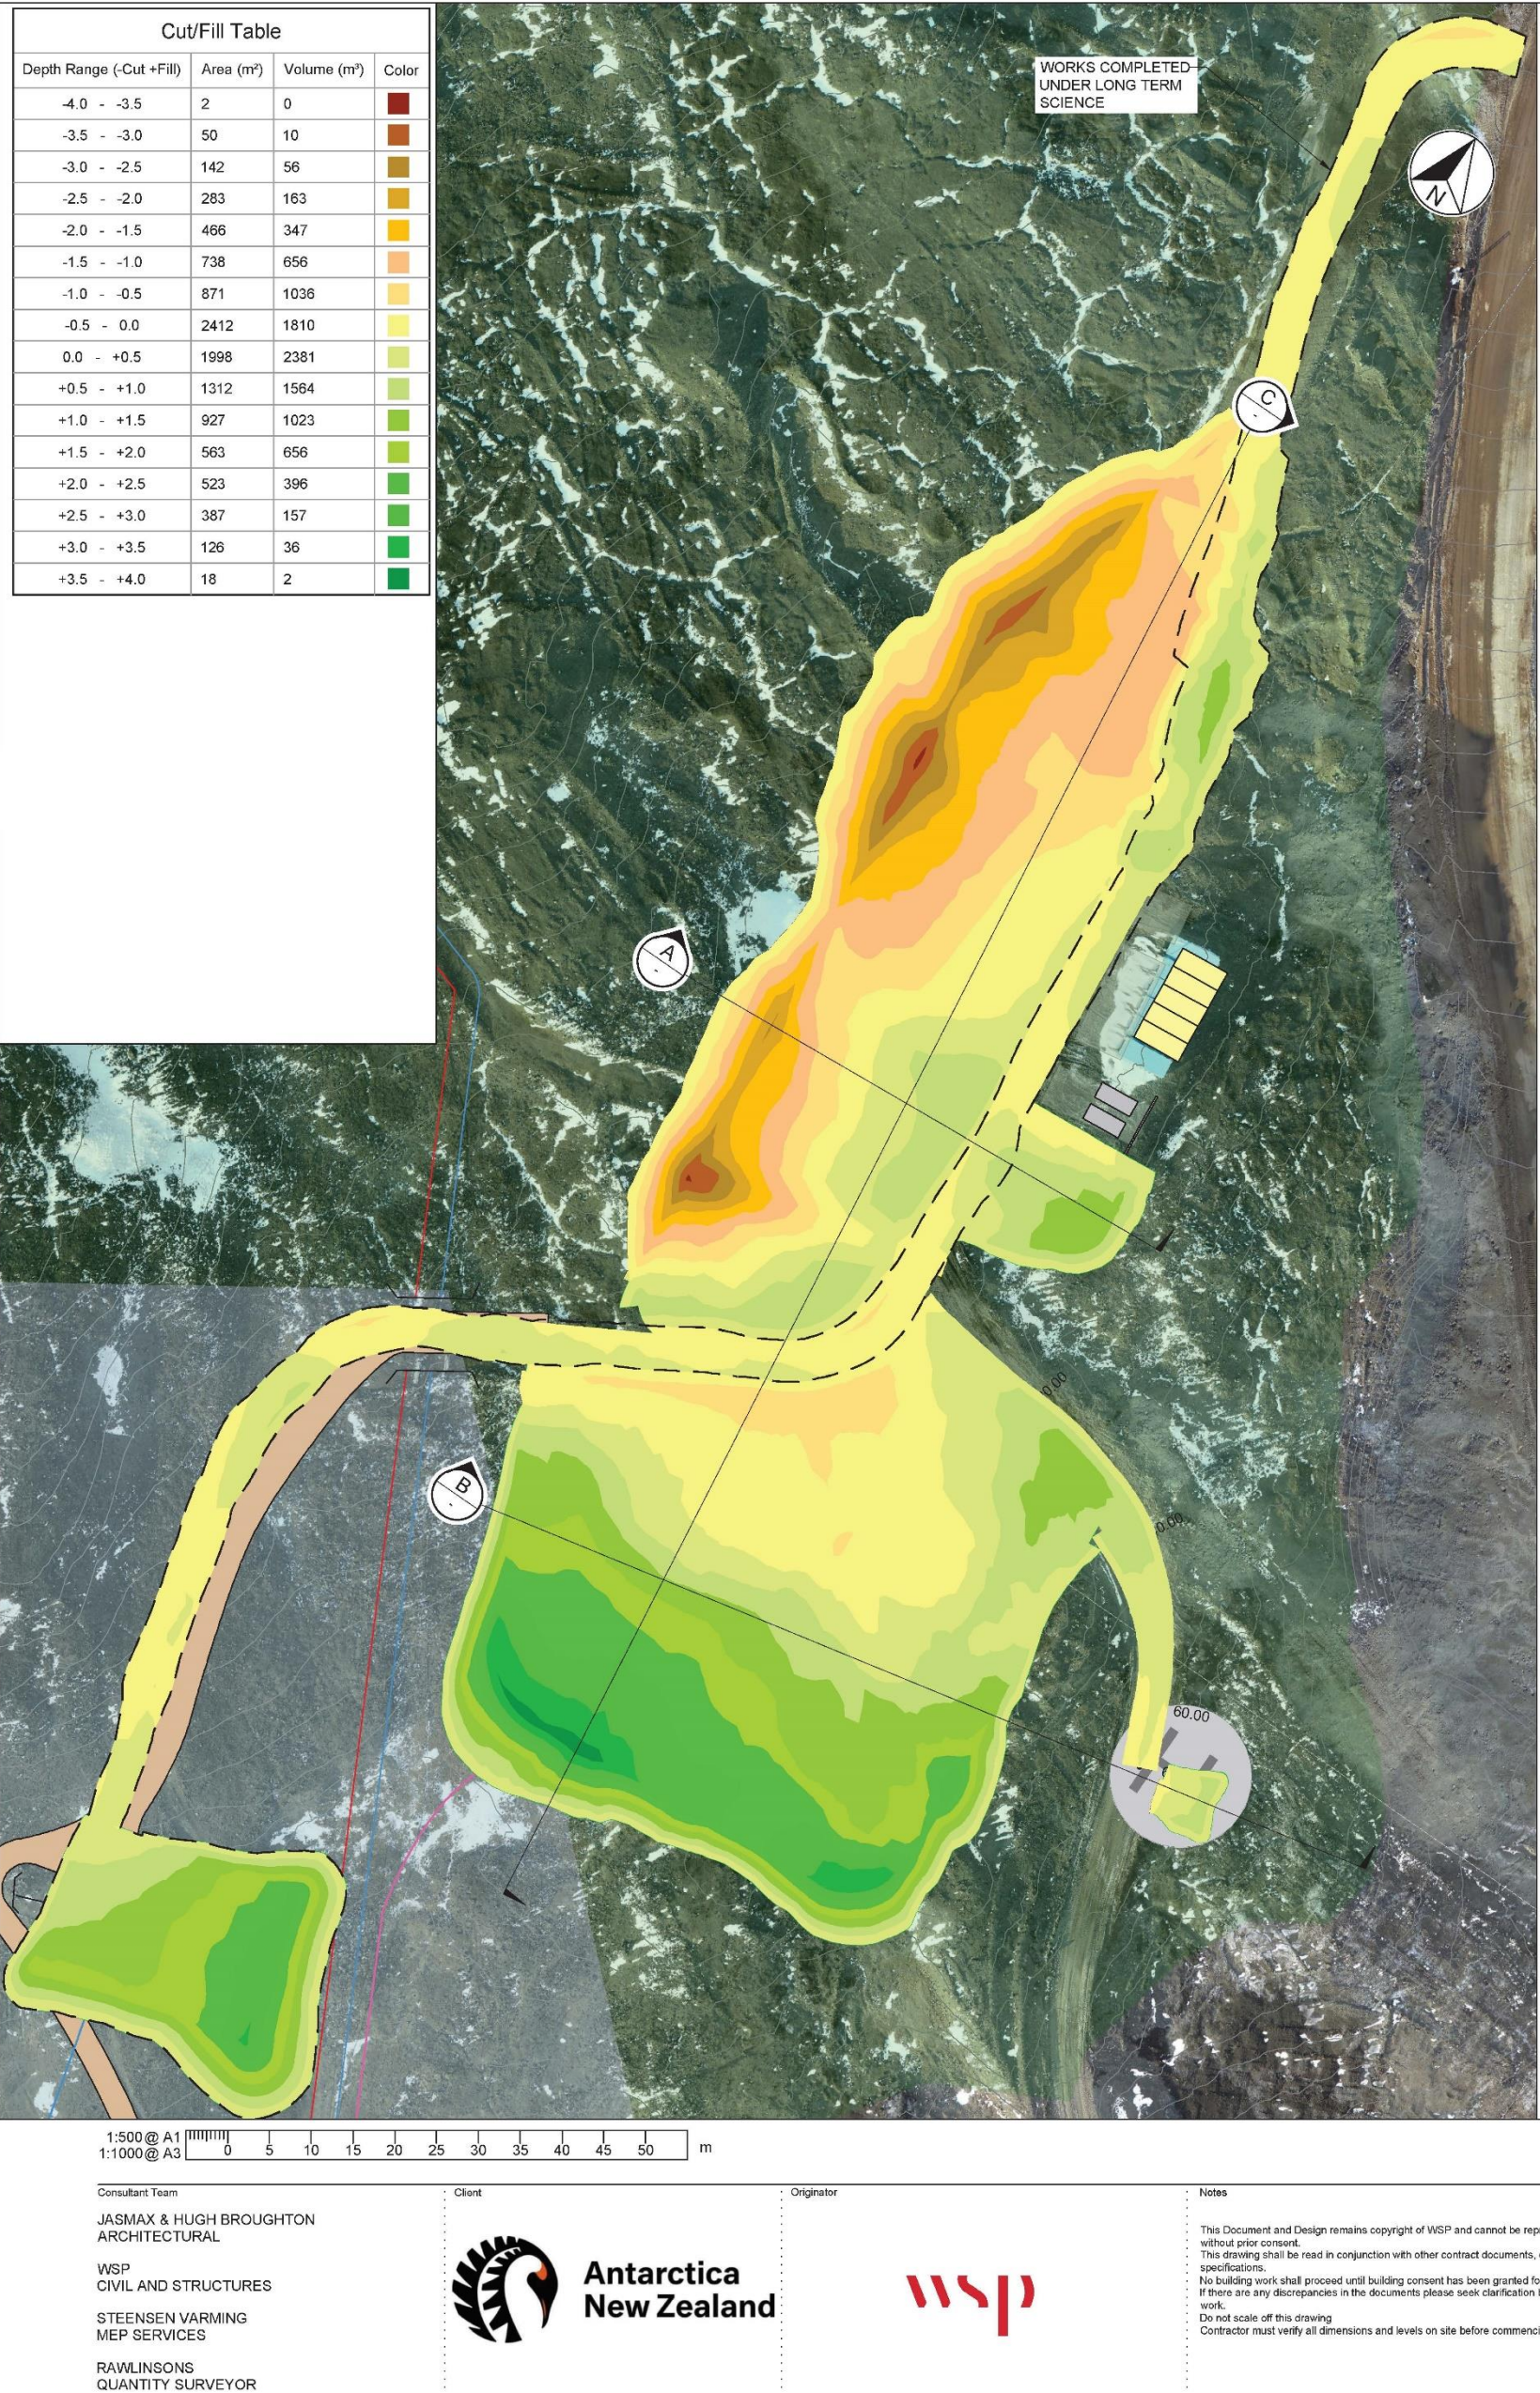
Preliminary Temporary Base Site A earthworks requirements. Note that the area and volume of earthworks proposed is smaller with more precise planning and design.
